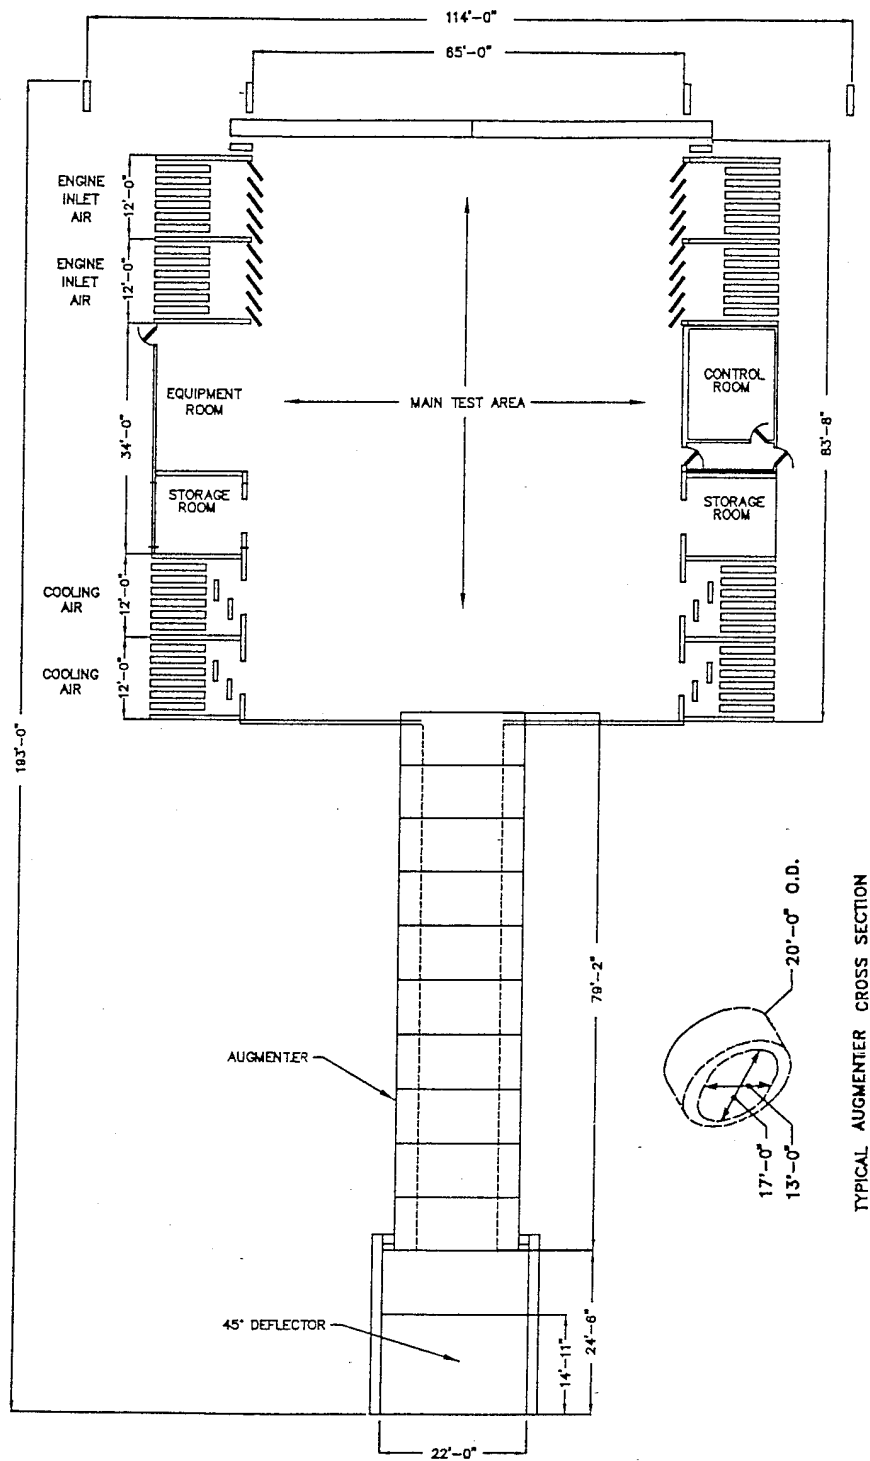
Plan View of a Typical Type T-10 Air Force Hush House
